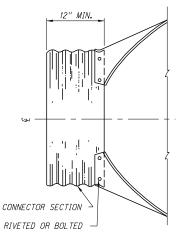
# DETAILS OF METAL FLARED END SECTION (FOR CORRUGATED METAL PIPE)
